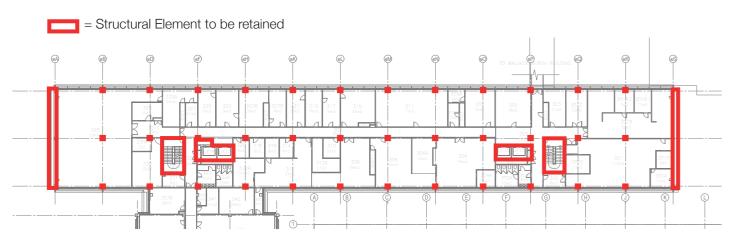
Diagrammatic plan showing typical structural elements to be retained
